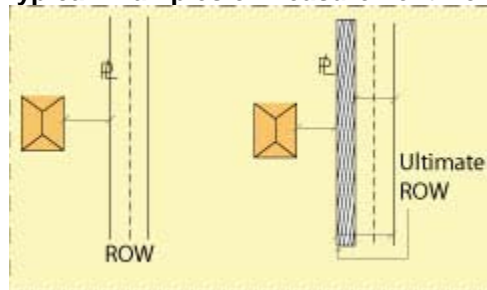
C.4.H-10-Typical Examples of Measurement for Surface Area
